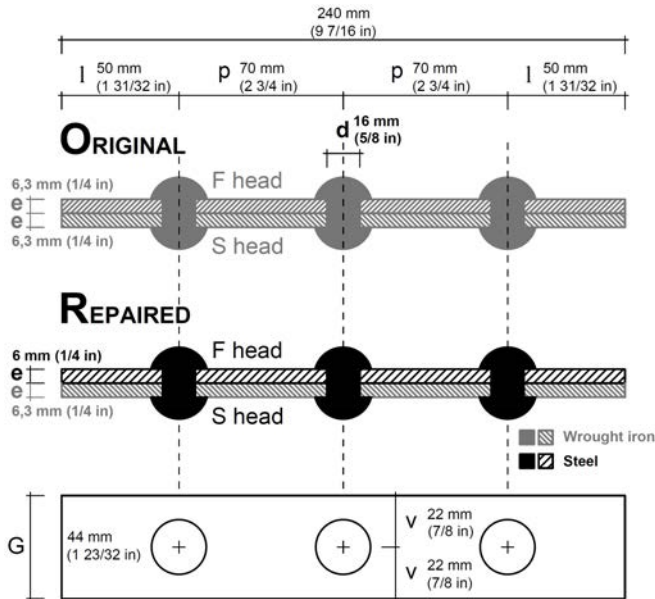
Elevation and plan views of the triple riveted specimens belonging to the types O and R
